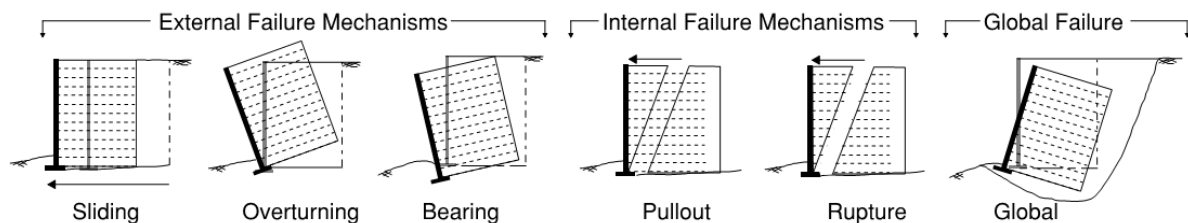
External, Internal and Global Failure Mechanism for MSE walls
